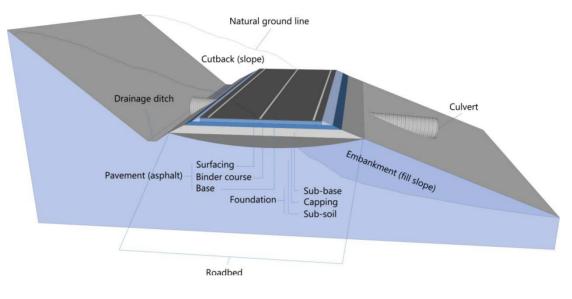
Typical (asphalt) road components: Pavement and foundation
